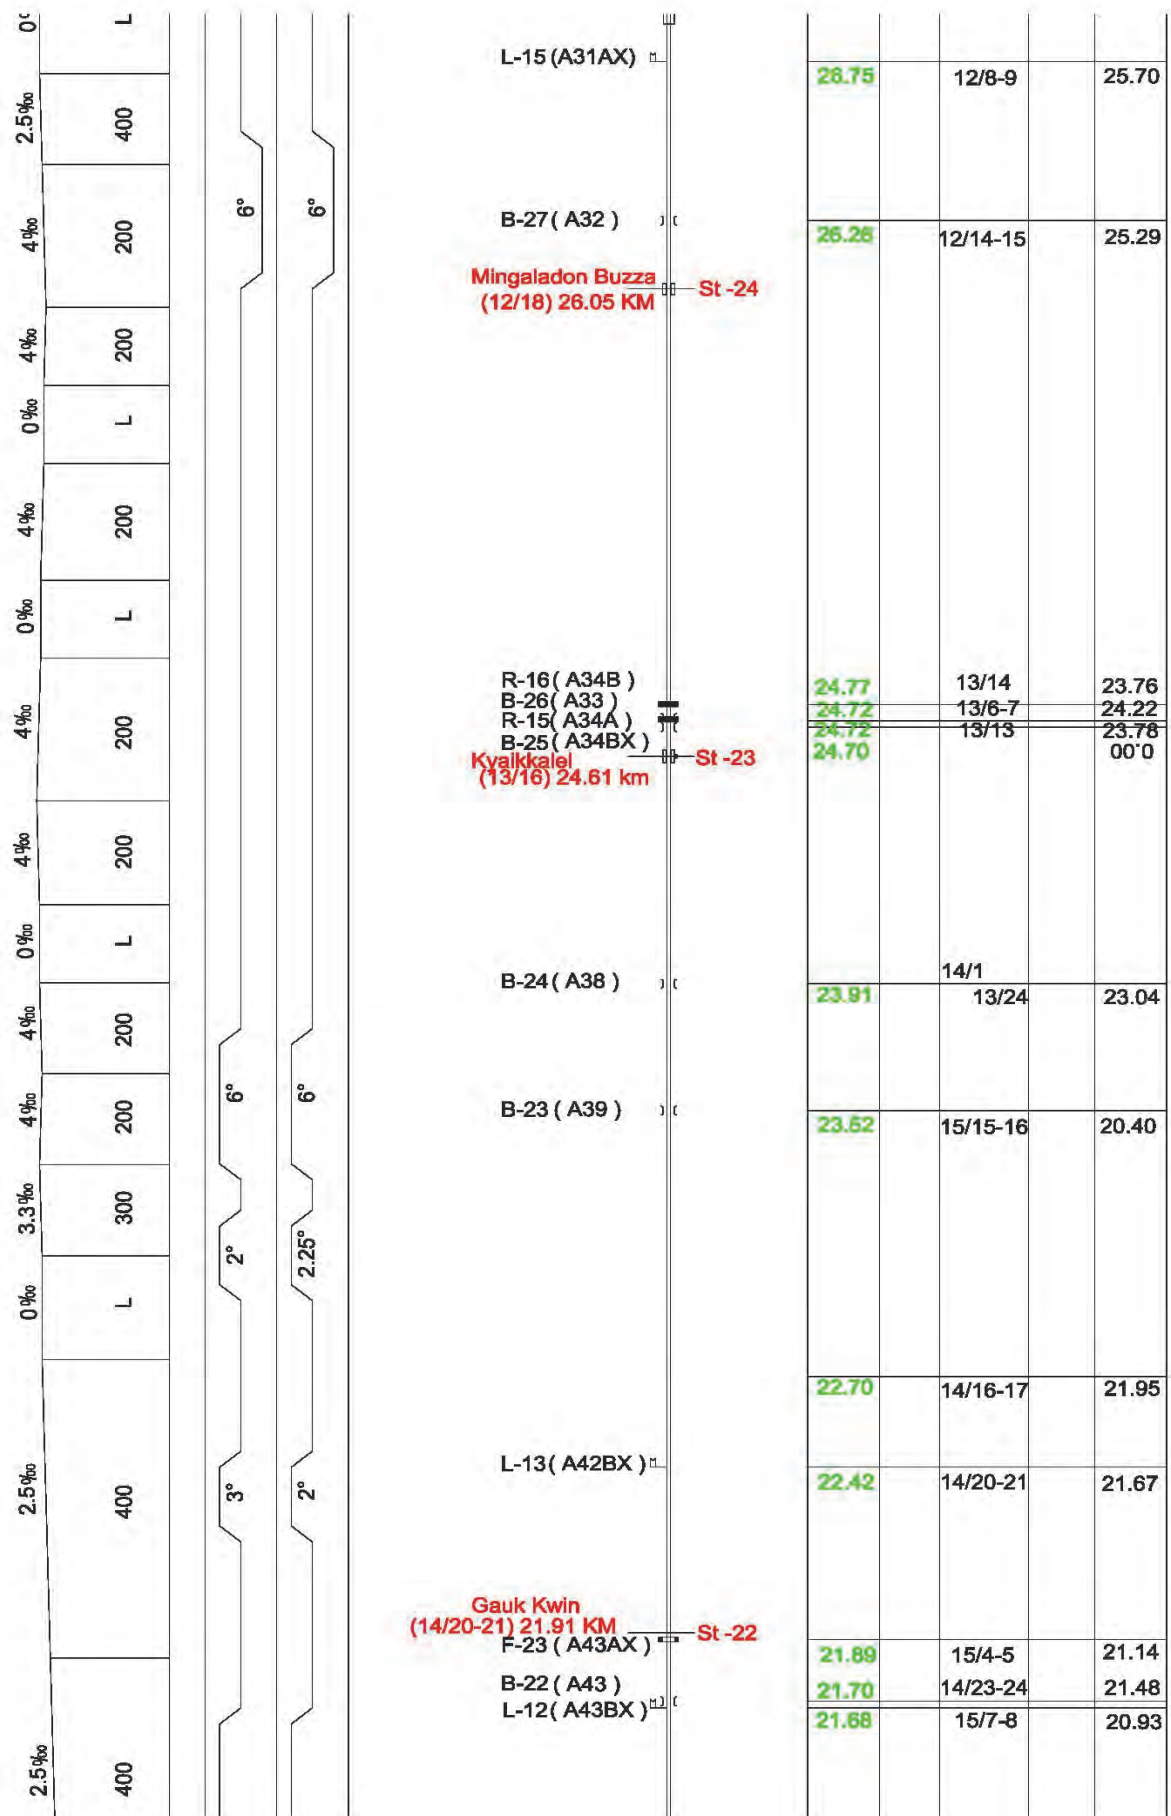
Schematic Sketch on Existing Yangon Circular Railway (5/9)
